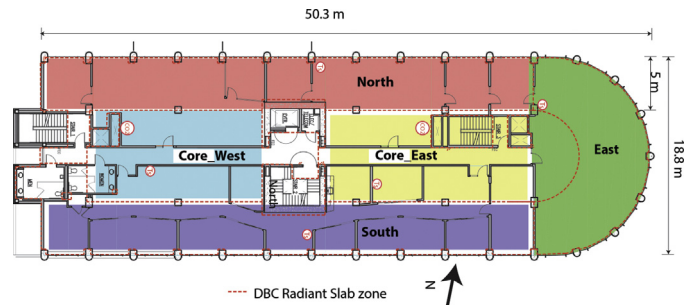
Typical floor plan of DBC building and radiant system zoning.
